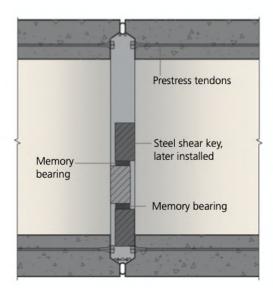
Side section view of steel shear key arrangement at immersion joint (Lin et al, 2022)
